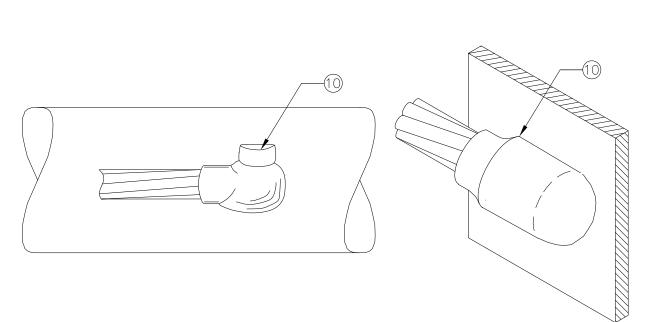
G — HORIZONTAL THROUGH WIRE TO A VERTICAL STEEL SURFACE. WIRE OFF THE SURFACE.
